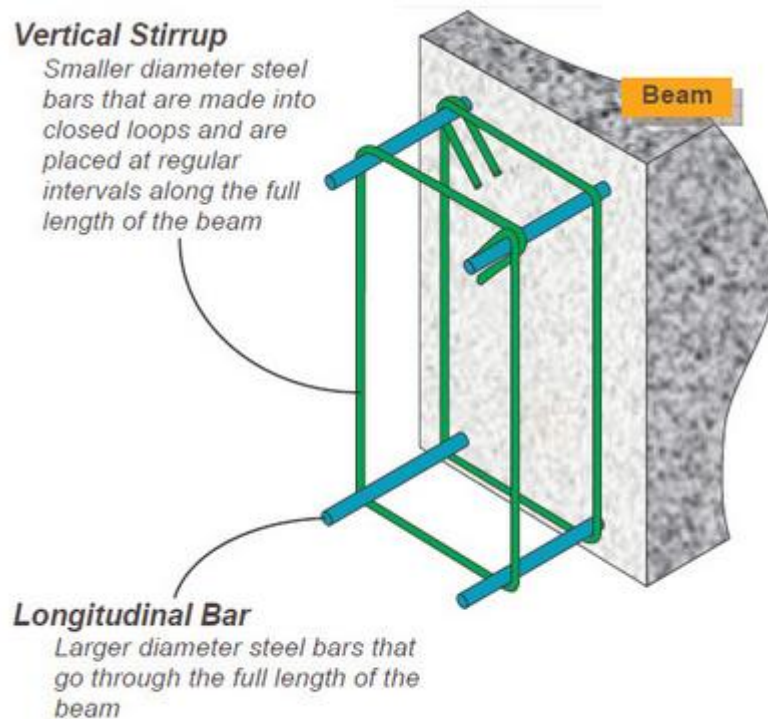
Steel reinforcement in beams - Stirrups prevent longitudinal bars from bending outwards
